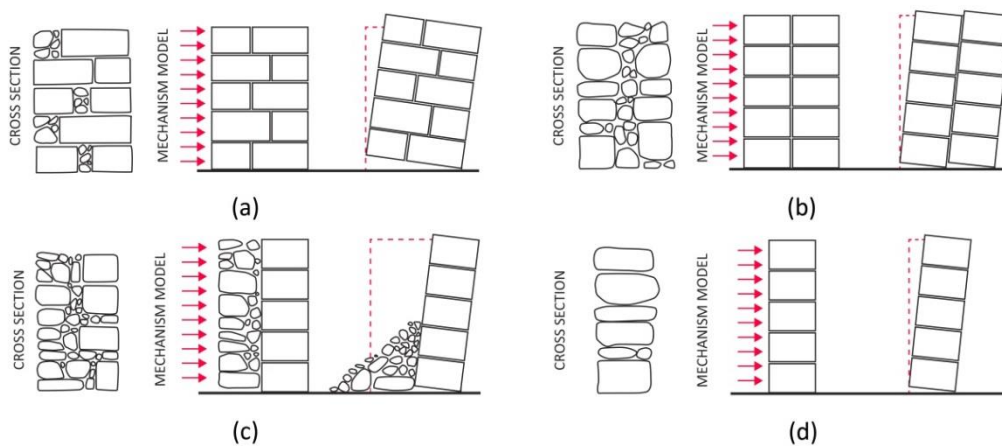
Structural behavior of multiple-leaf stone masonry walls according to the quality of transversal connection among leaves (adapted from Binda 2009)
